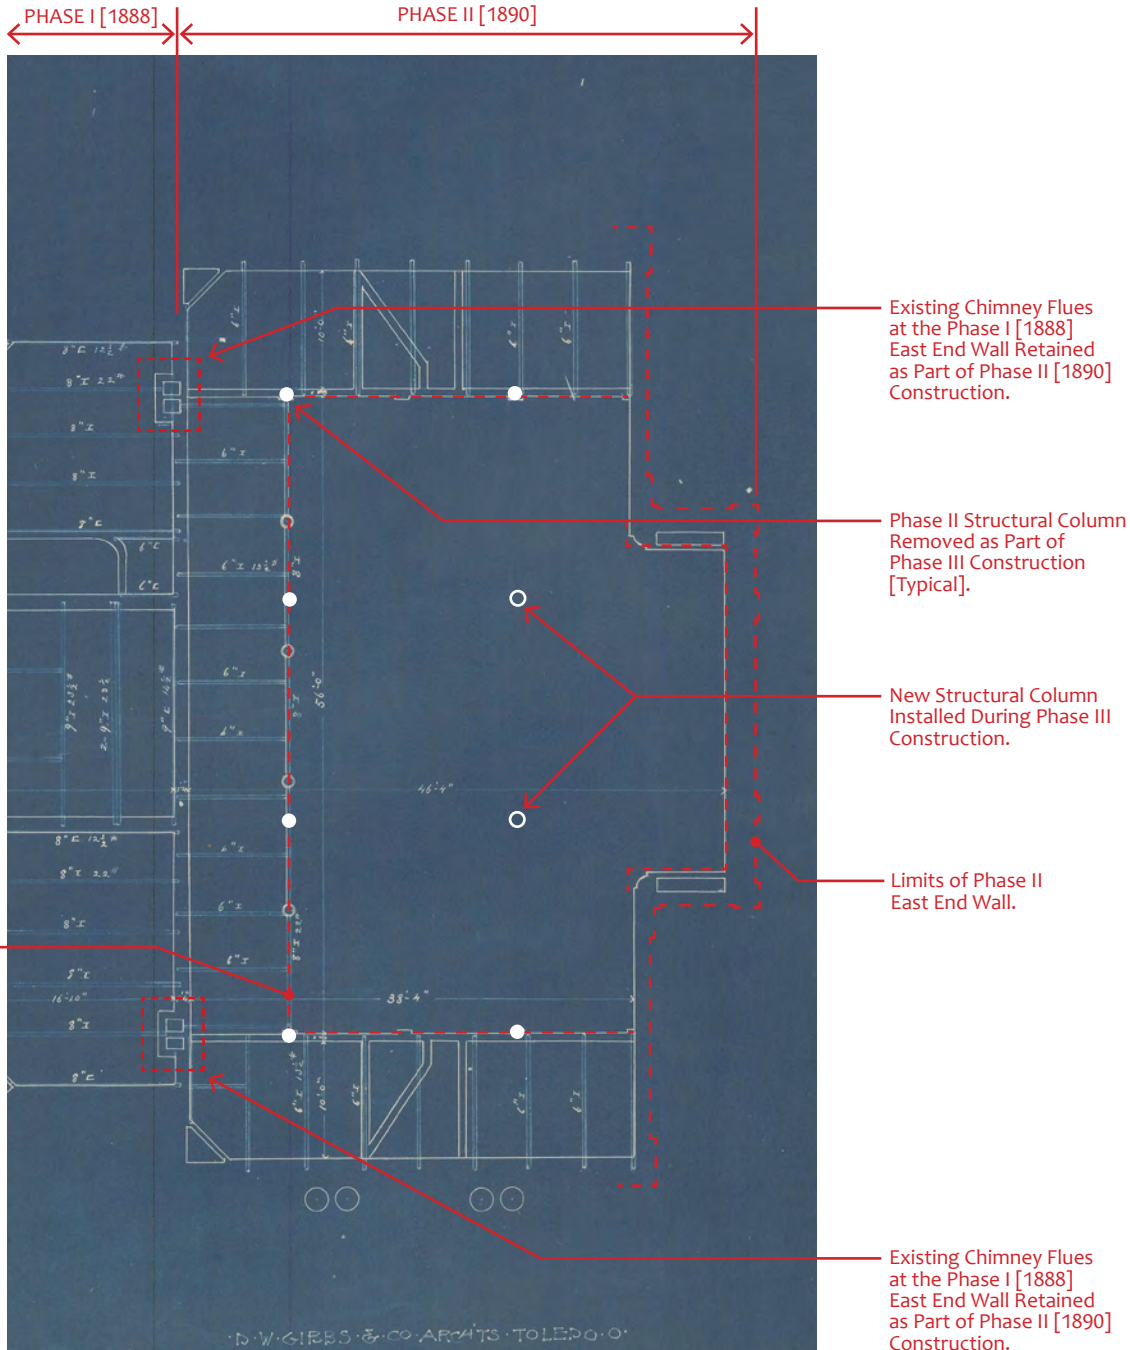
Phase II Third Floor Plan Framing Plan [East], Illustrating the Phase II House Chamber.
